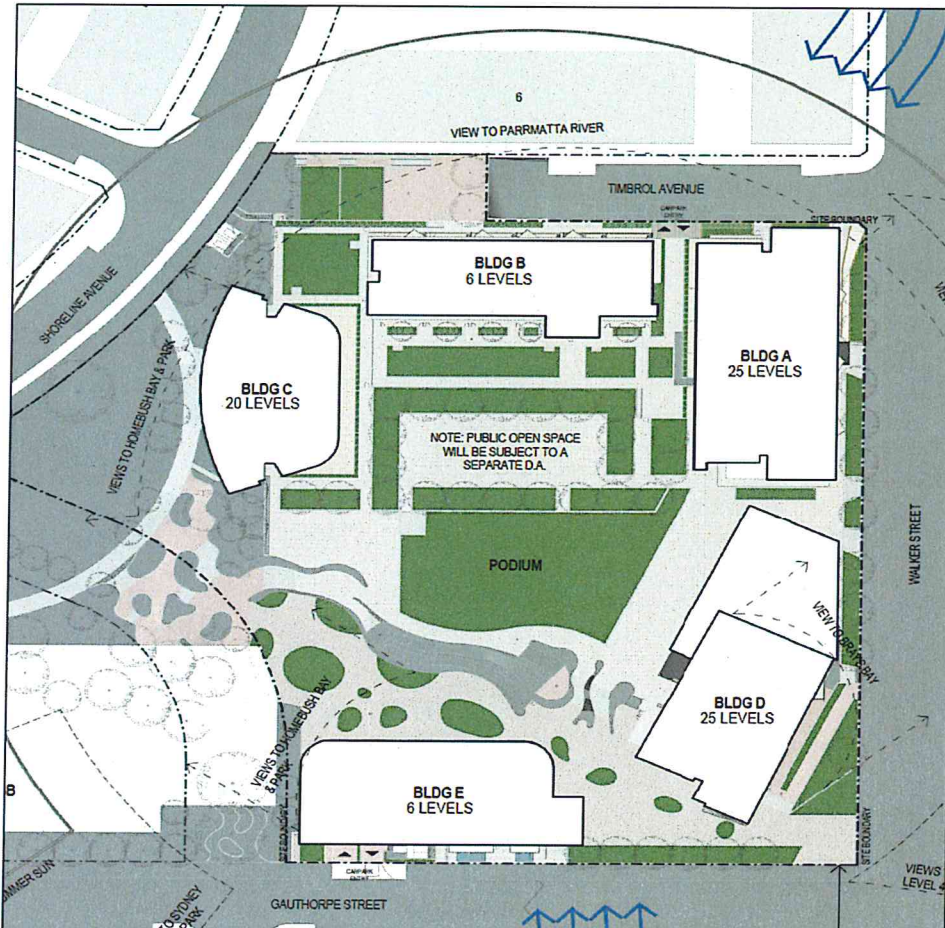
Sites 2A and 3A – Walker Street, Rhodes (source: proponent)
